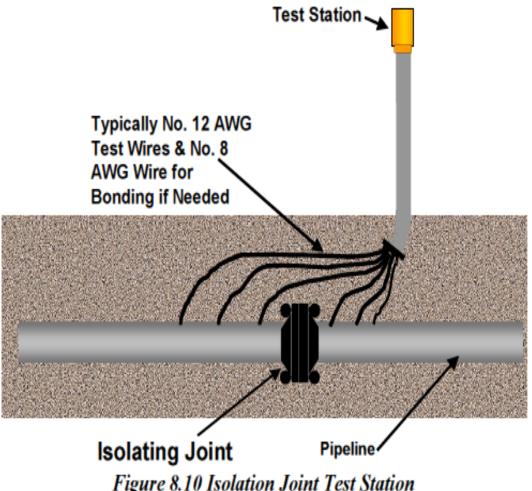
Isolation Joint Test Station Mitigation Bond
